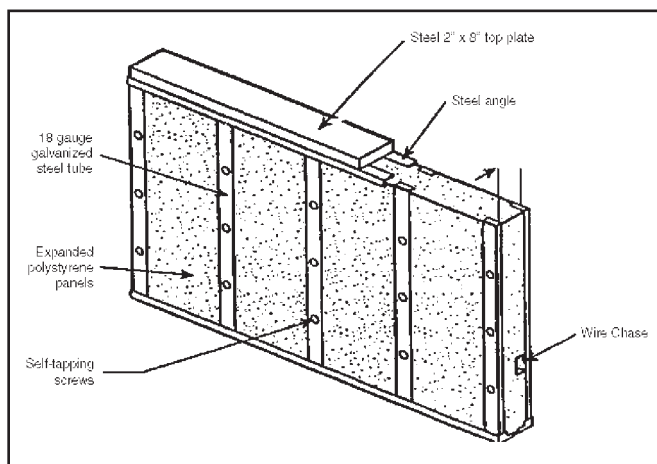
Energy Wise wall panels are rectangles of expanded polystyrene foam fitted with embedded steel studs.
